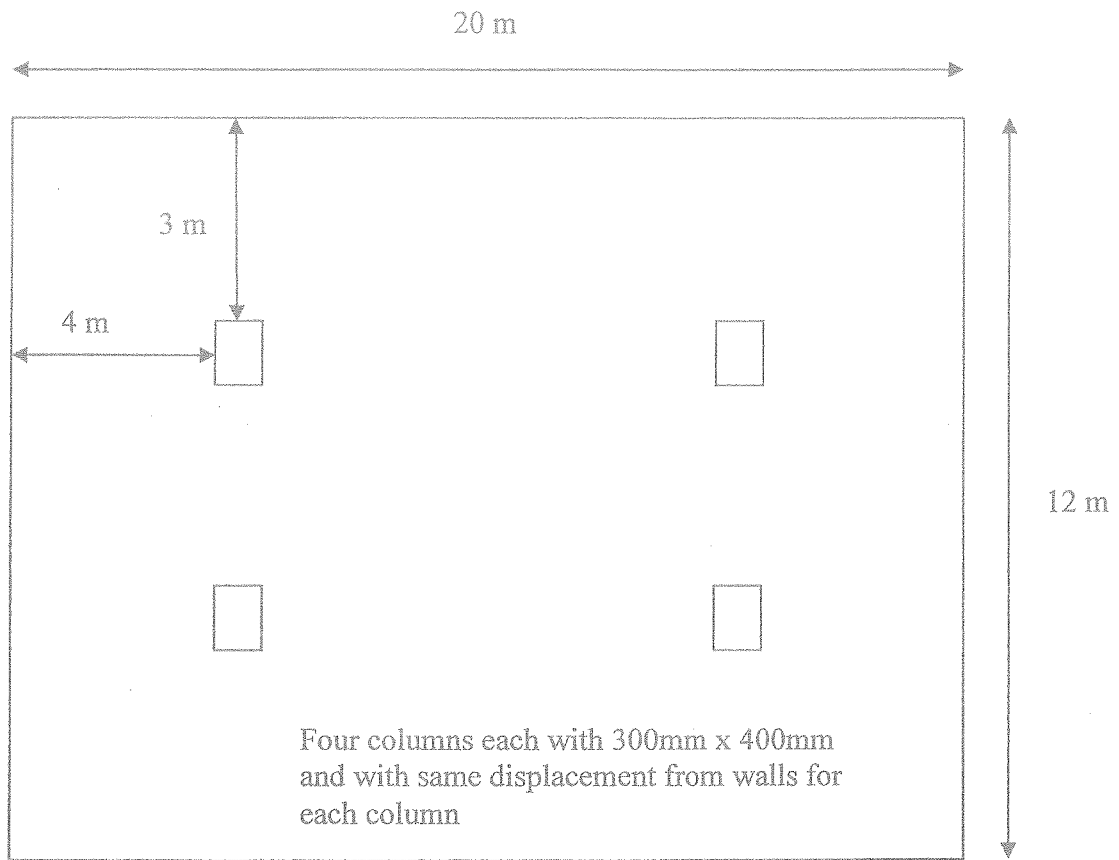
Ground Floor Plan of the Proposed Educational Building
